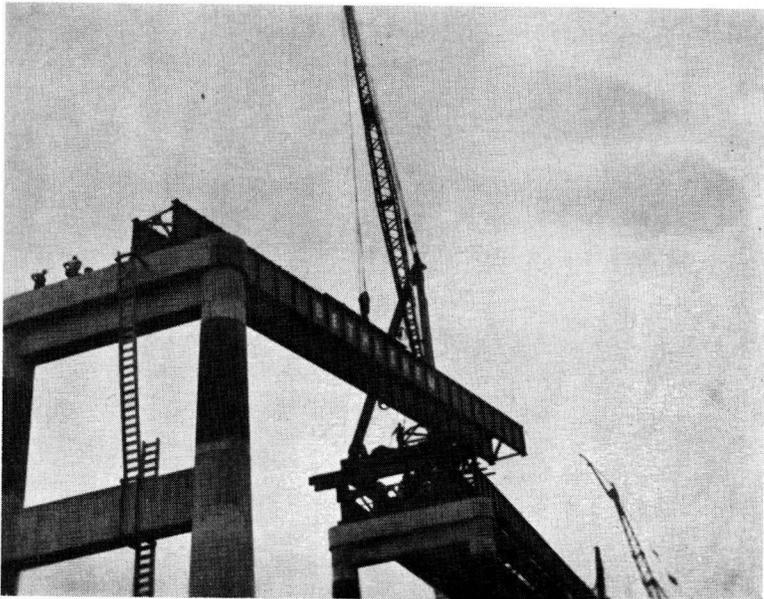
Braced pair of girders using permanent cross-frames and temporary top flange bracing.
